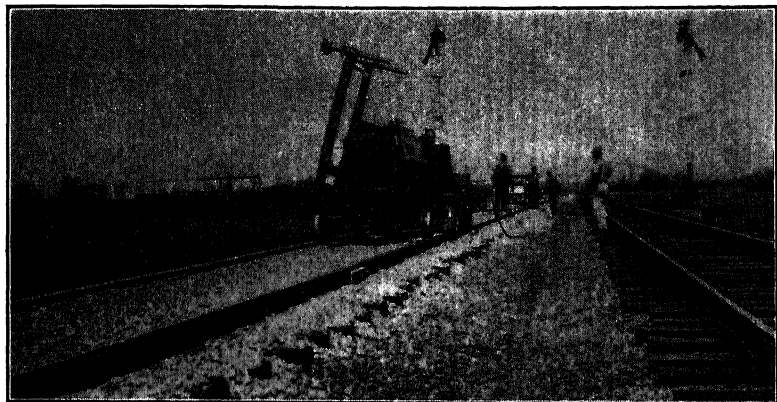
Building up battered rail ends on the main line of a Class 1 railroad. The welder supplies electric power for welding and for grinding.
